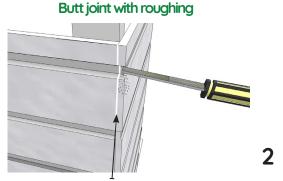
mm AND 11 mm SIDING FASTENING
